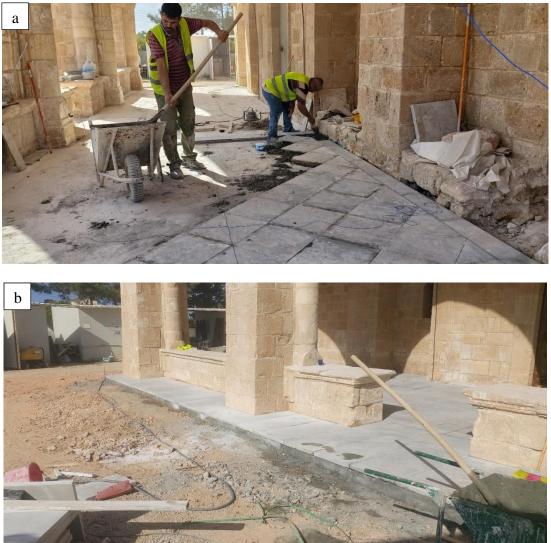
a) Construction of new floor with Local stone stage 1 b) Stage 2
